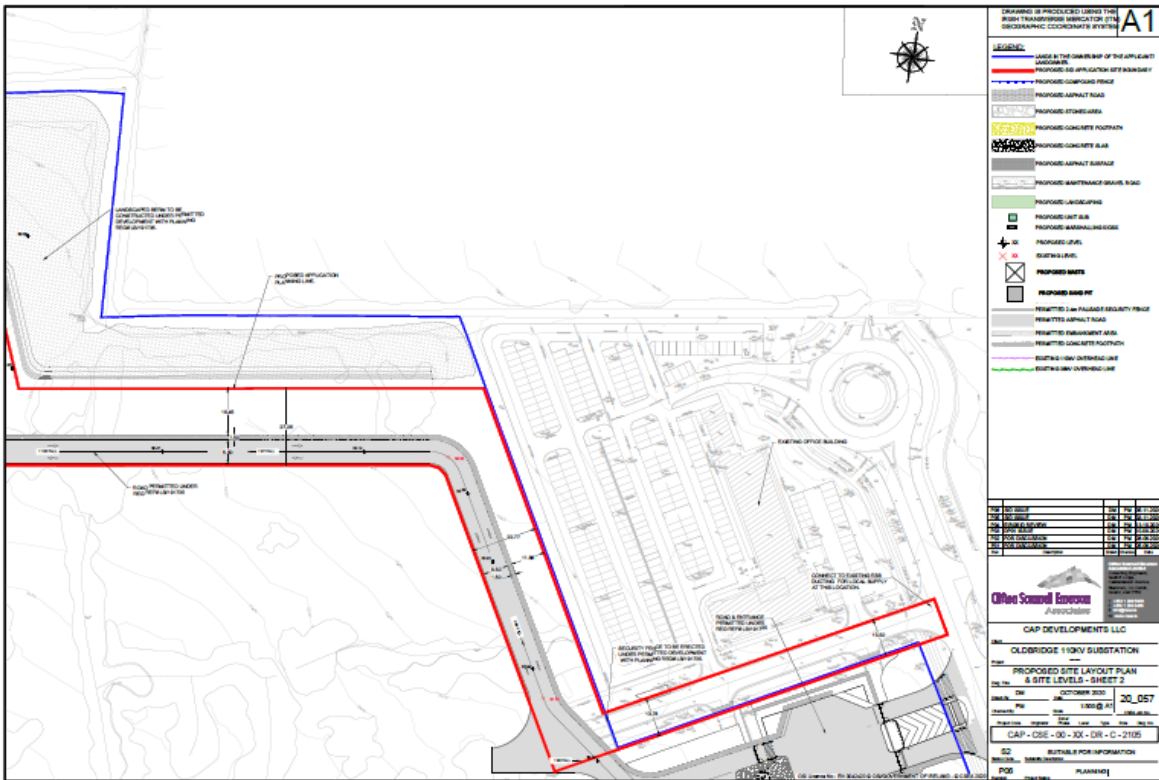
(b). Site layout plan of the Proposed Development (Source: MCA)
